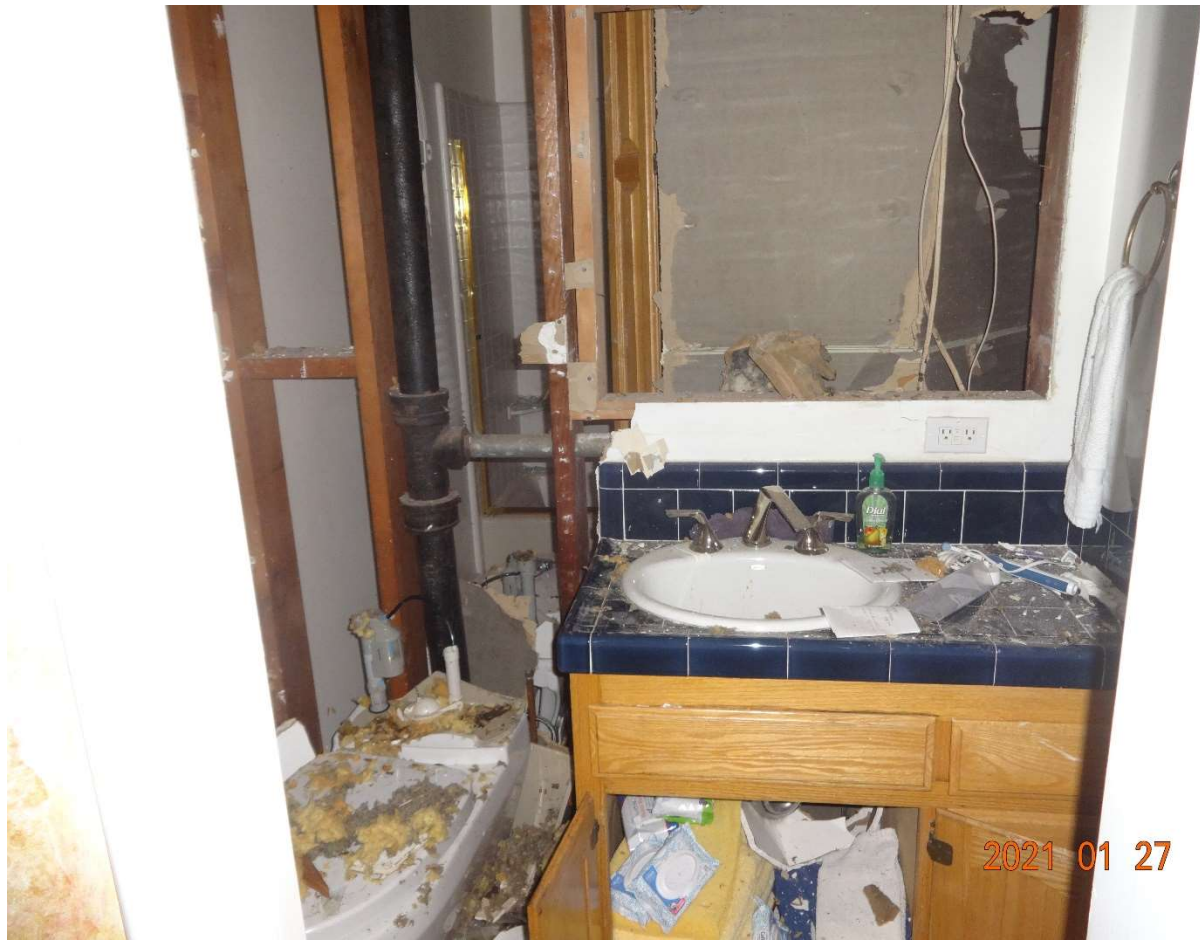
The damage to the South bathroom. The sheetrock and insulation had blown out from the wall. The toilet tank was shattered.
